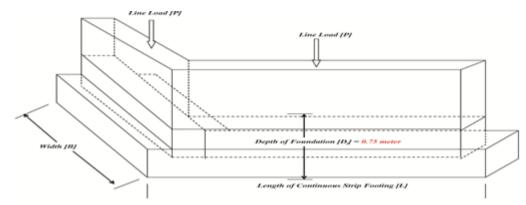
Schematic of dimensions of a Continuous Strip Footing
